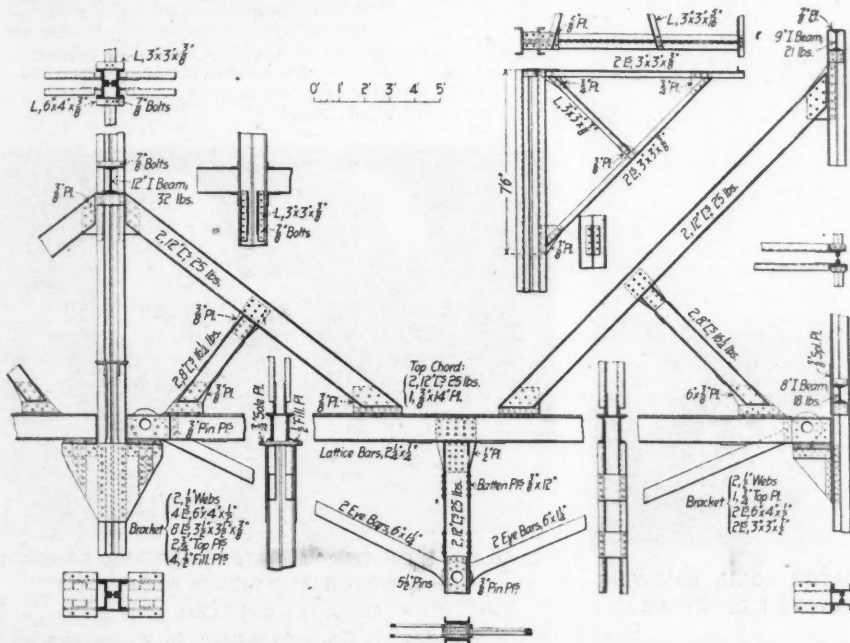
DETAILS OF THE TRUSSES, COLUMNS AND FRAMING OF THE COAL STORAGE BIN.
